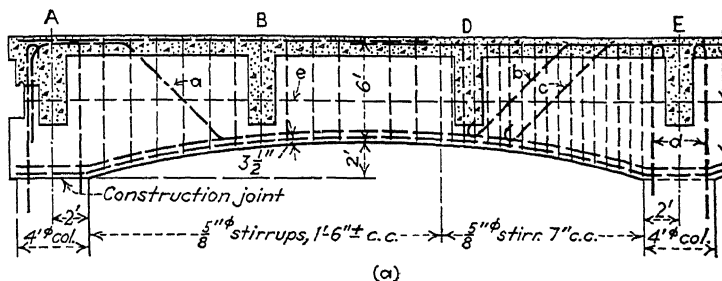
Girder used in New Jersey approach to Lincoln Tunnel, New York City.
